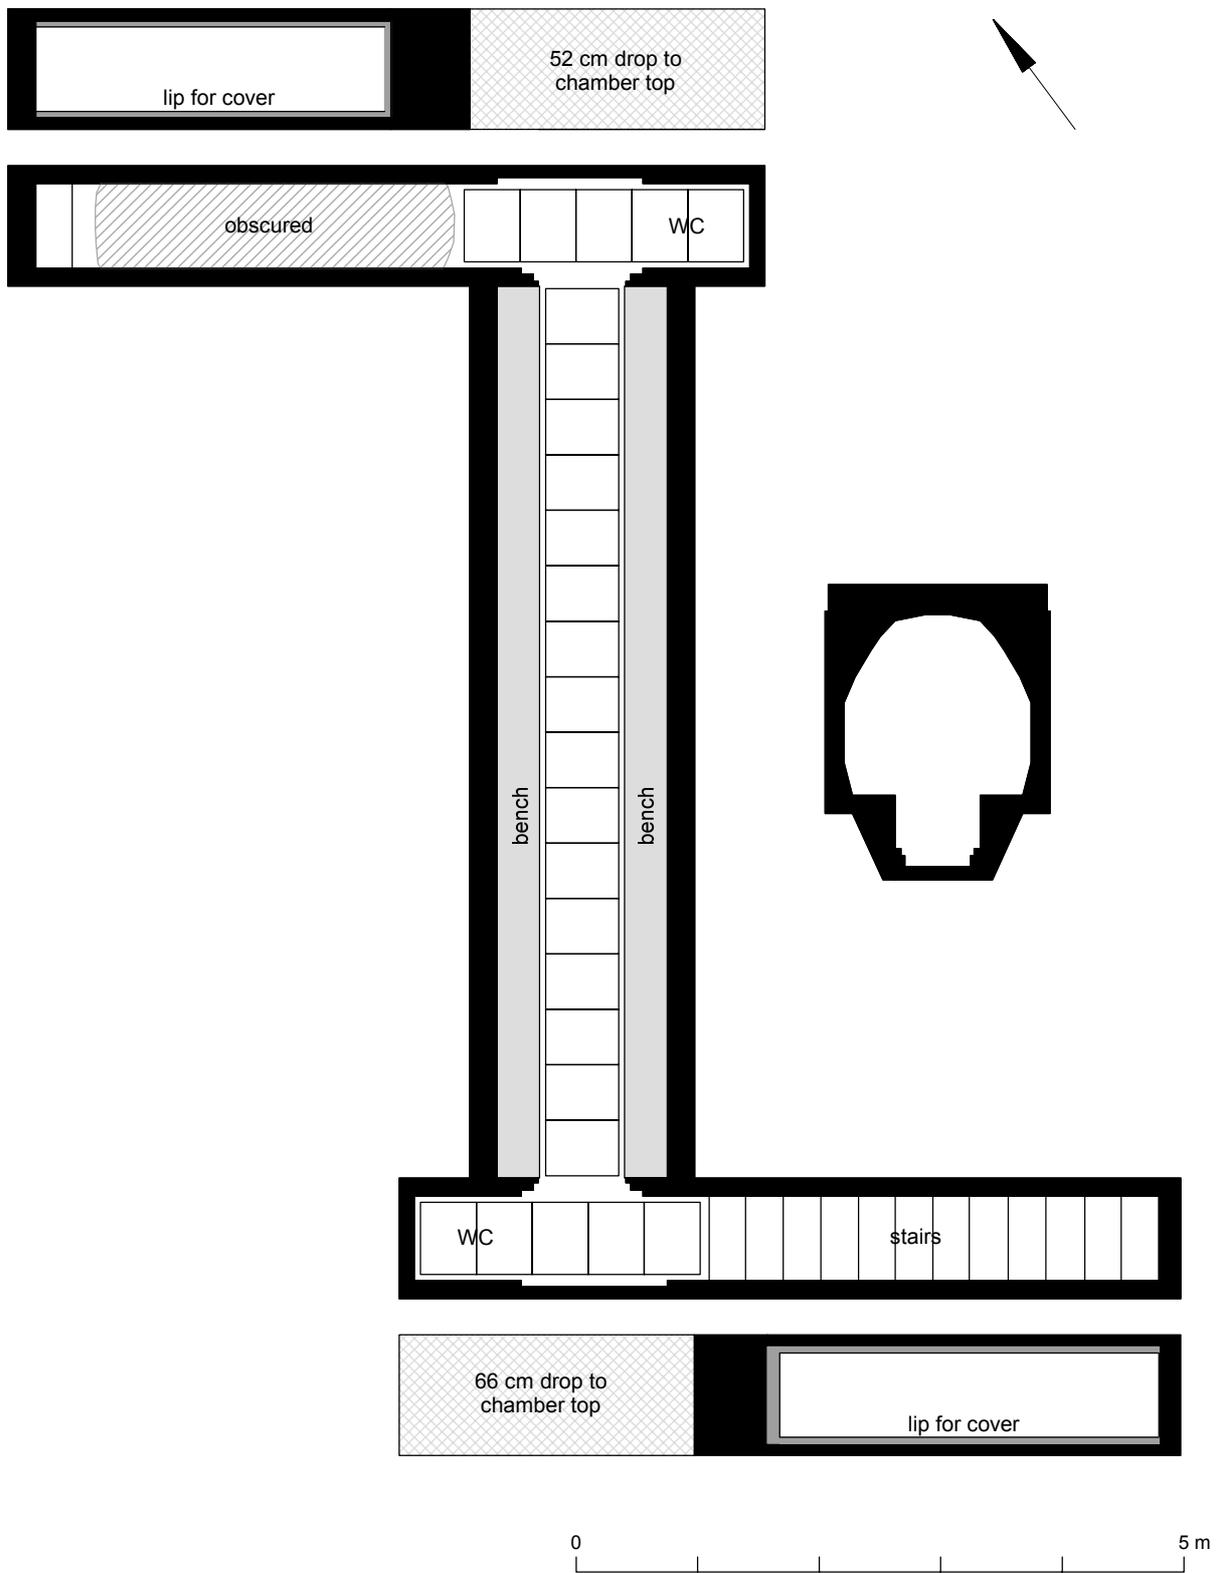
Area J1, air-raid shelter F6: internal plan and cross-section of chamber.
